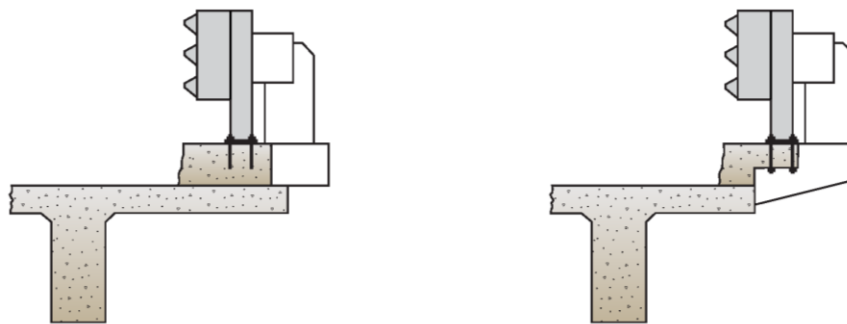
Anchor Examples. Bonded Anchor (left). Through Anchor (right).
